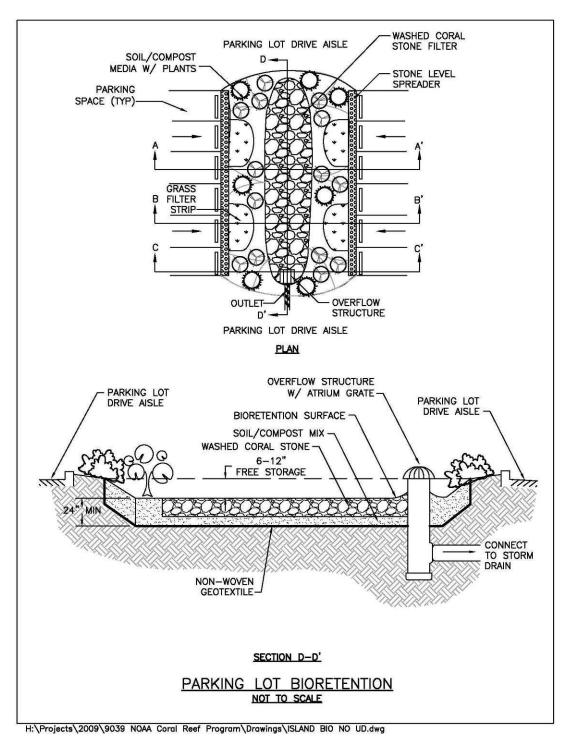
Plan view and longitudinal section for <u>infiltration</u> design version (no underdrain).
